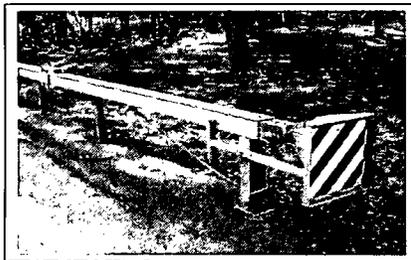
Box Beam Guiderail Type III BEAT End Terminal
